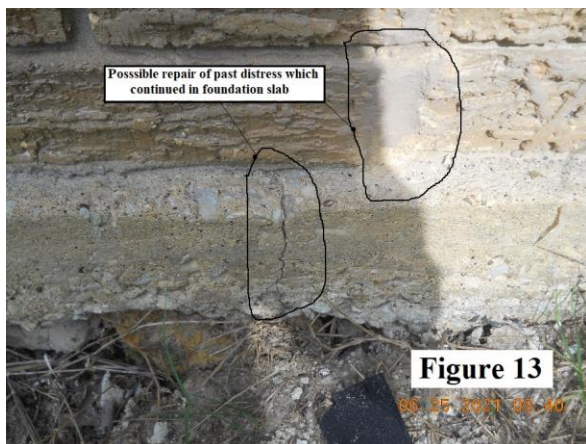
shows an example of the repair of the masonry which continues into the foundation concrete.
